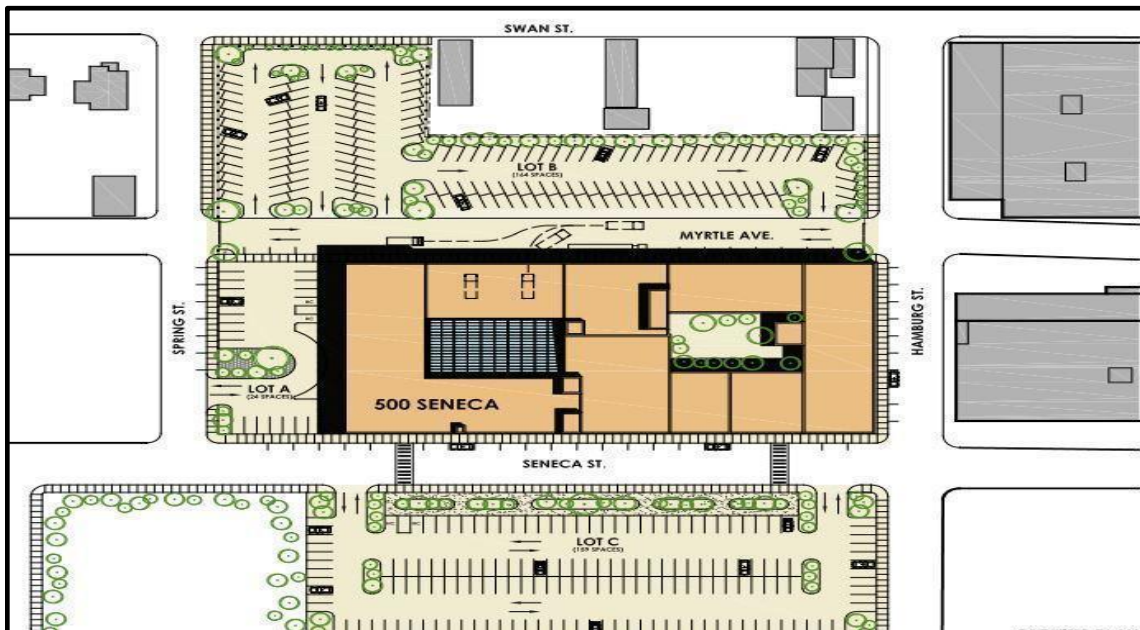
500 Seneca St. Site Plan (Source: CJS Architects)
